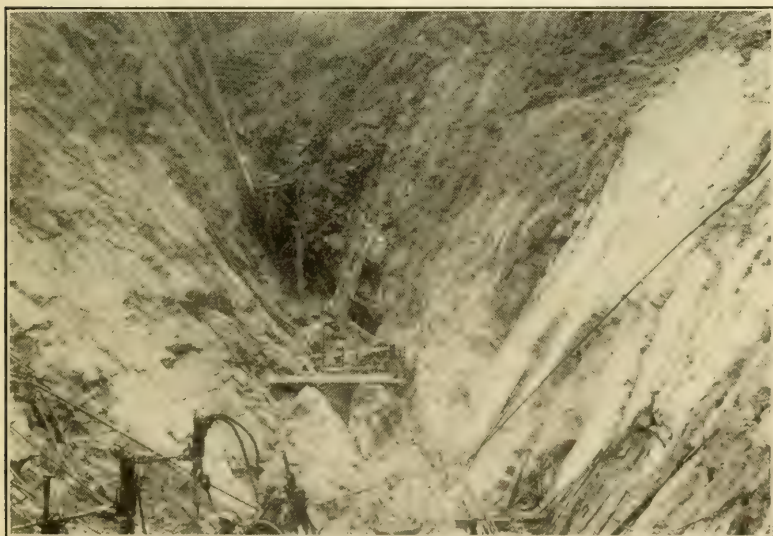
VIEW OF FOUNDATION OF KENSICO DAM.
